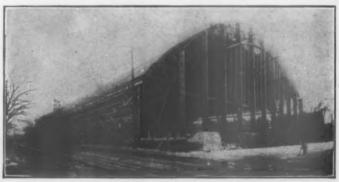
OPEN WEST END OF THE FIELD HOUSE, SHOWING STEEL PRACTICALLY COMPLETE AND BRICKING-UP OF END WALL STARTED
